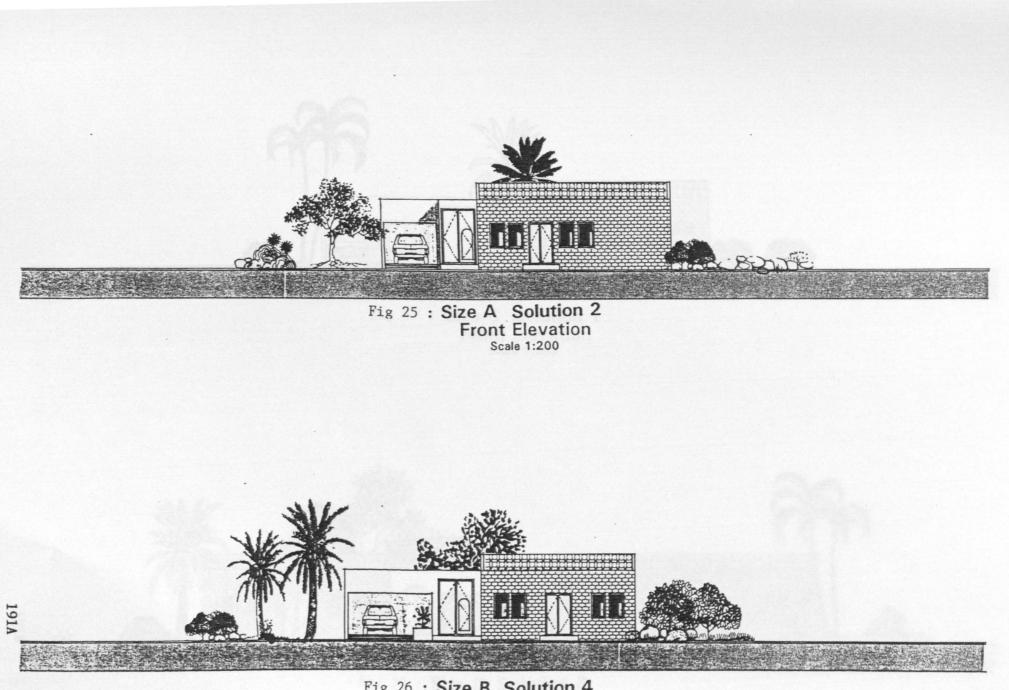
Size B Solution 4 Front Elevation Scale 1:200
